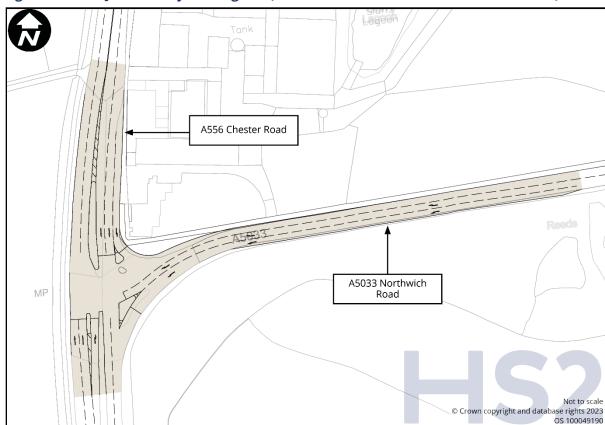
Junction layout diagram (A556 Chester Road/A5033 Northwich Road)
